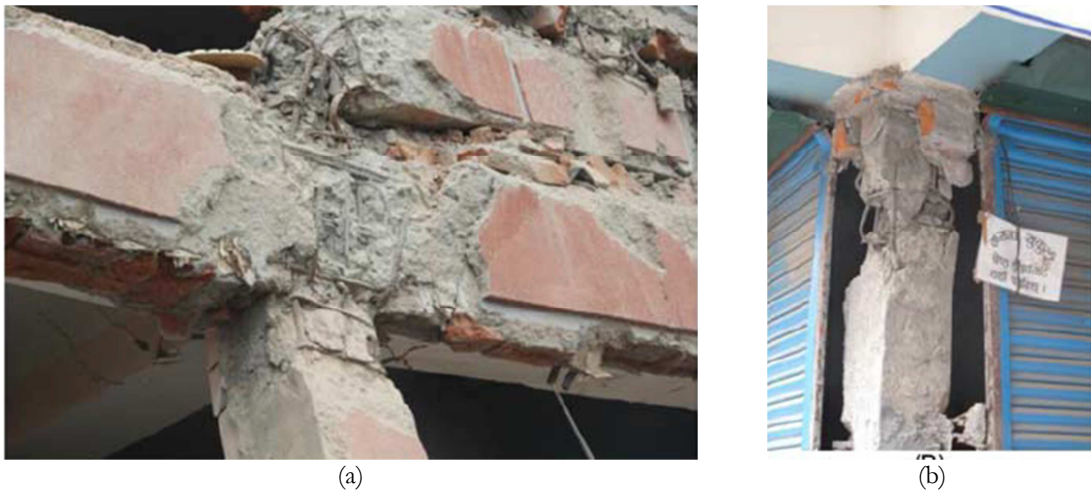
Failure caused by column rebar buckling; (a) Strong-beam and weak-column and insufficient lateral ties detailing and (b) Poor reinforcing steel bar detailing
